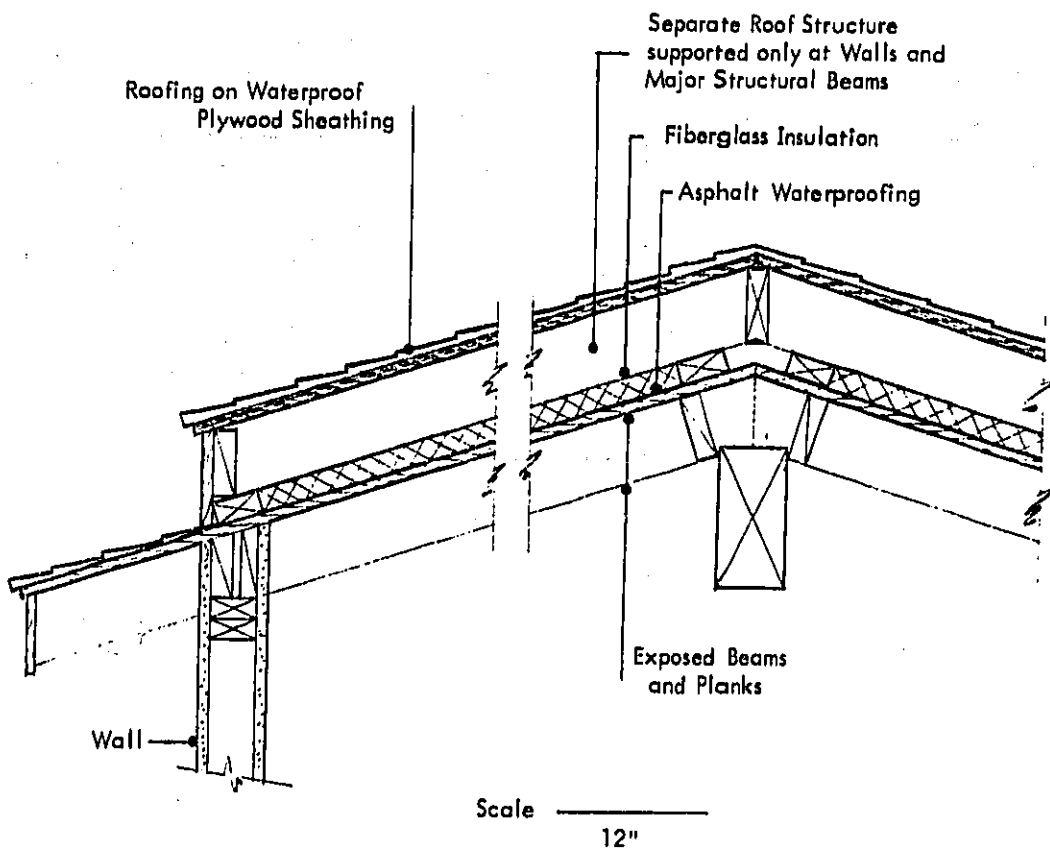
EXPOSED BEAM CEILING - STAGE 3
